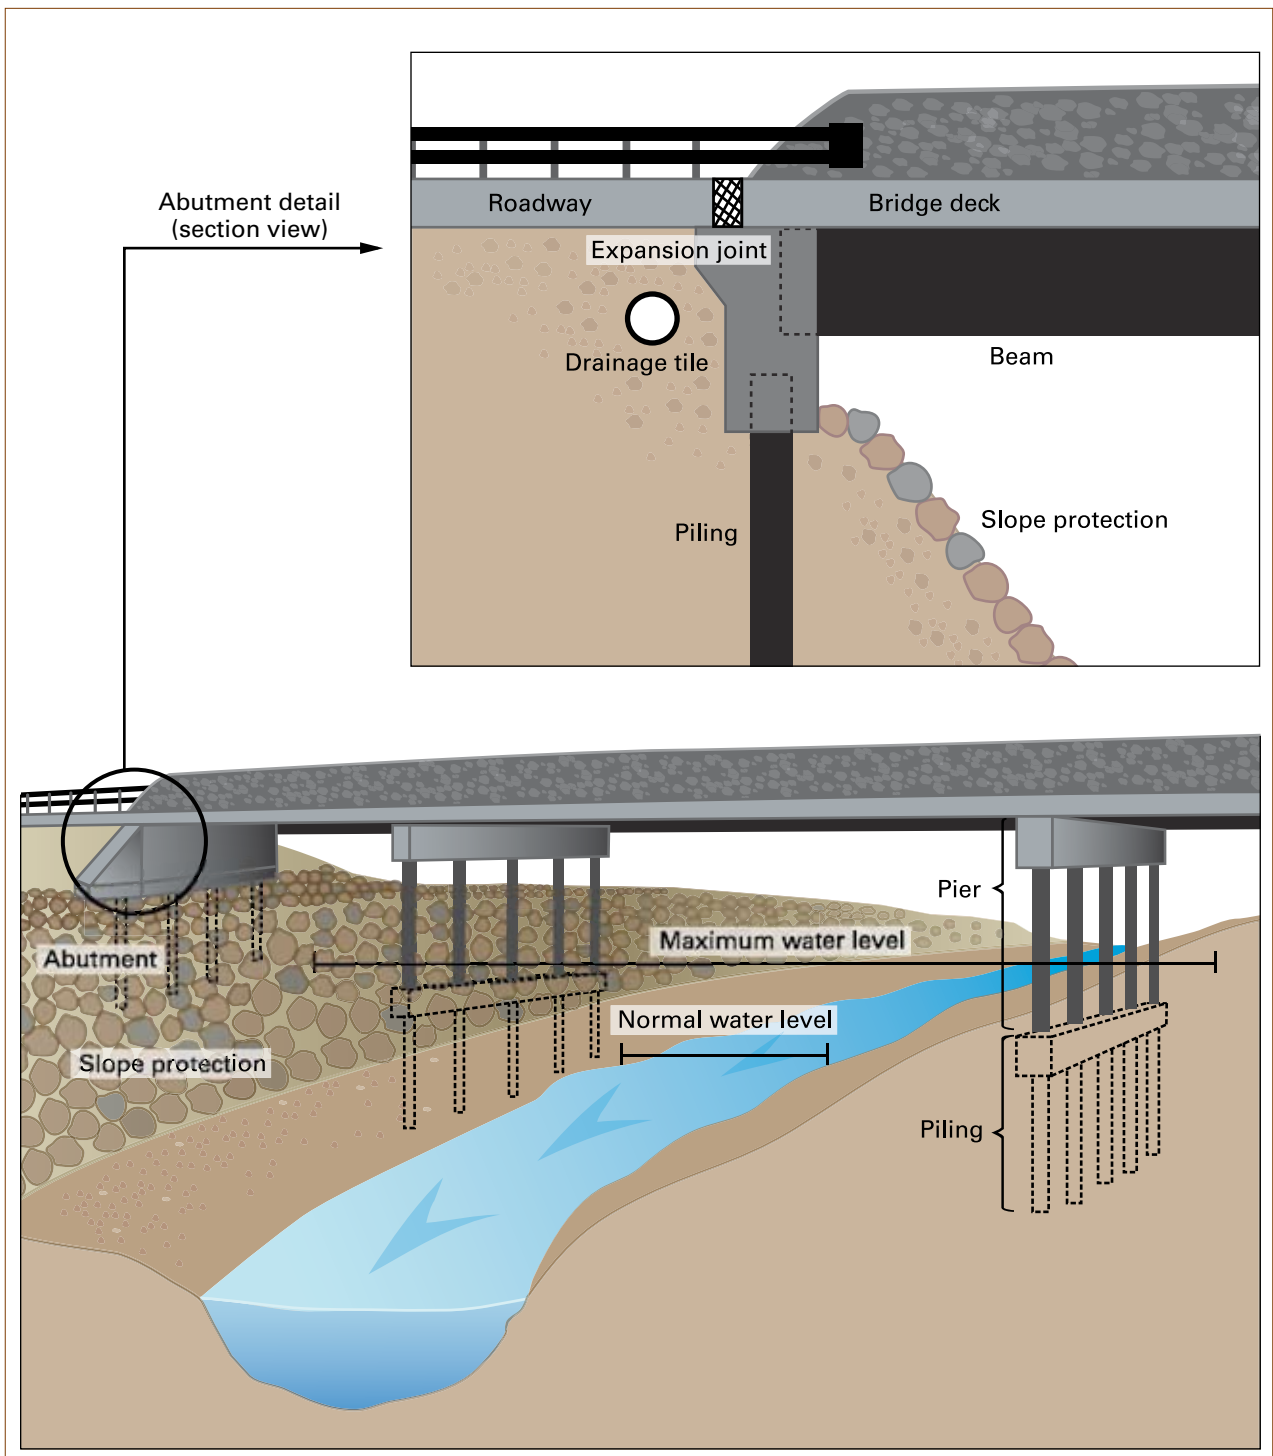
Elements to observe under the bridge (Adapted from Ettema, et al.)
